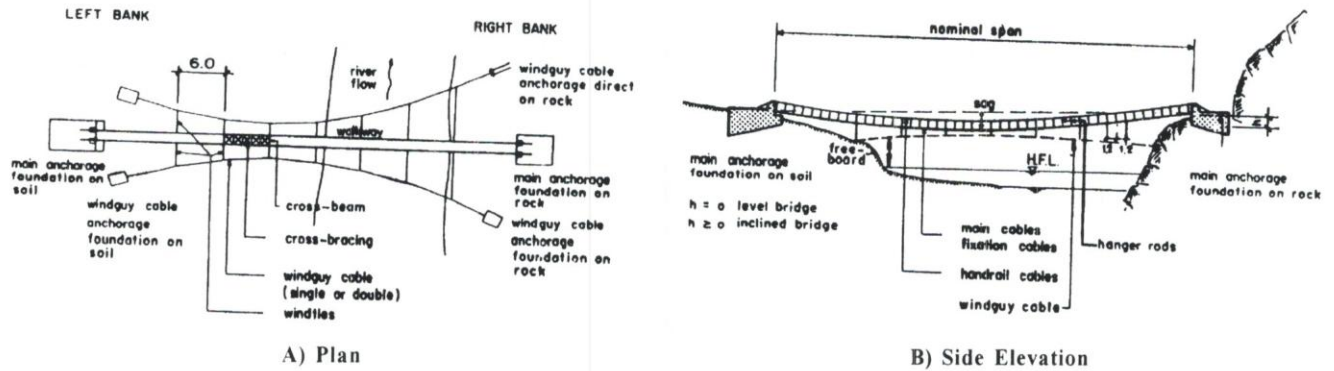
General layout of suspended bridge (source SBD Manual Vol. A, 1983).
